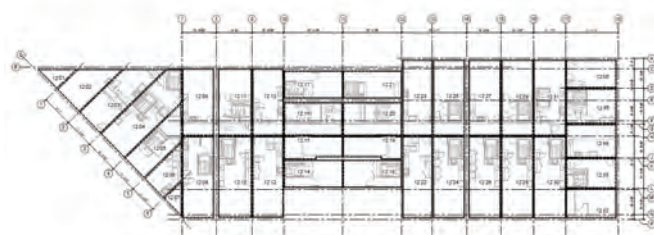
Typical modular floor plan with 36 modules per floor. (Source: Arup)
